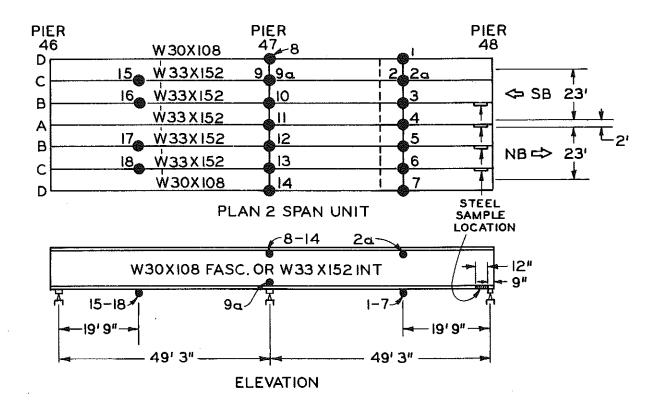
Strain gage and steel test sample locations for two-span continuous structure on north approach.
